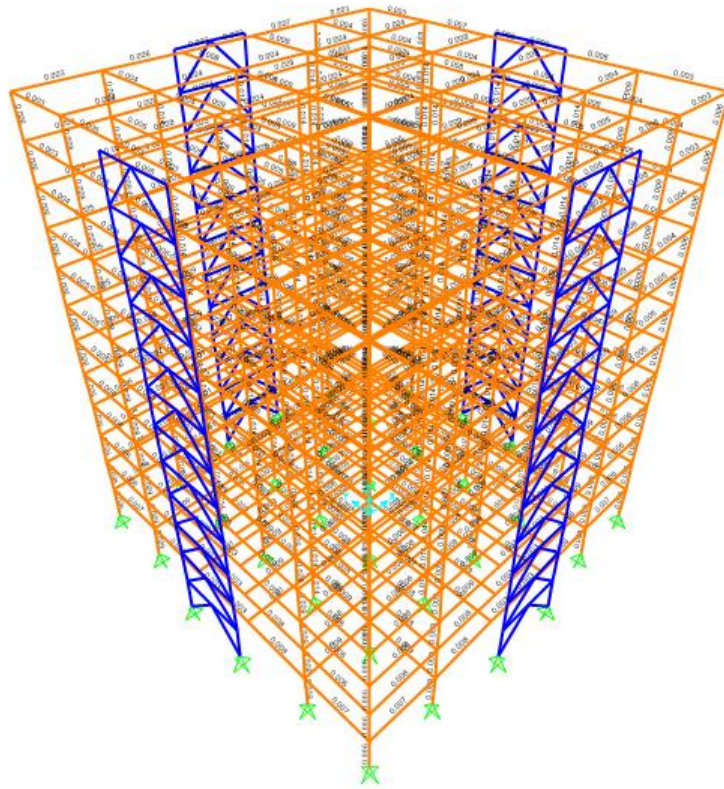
Design Results of 12-Story Strengthened Building Model using Inverted V-Type Bracing System
